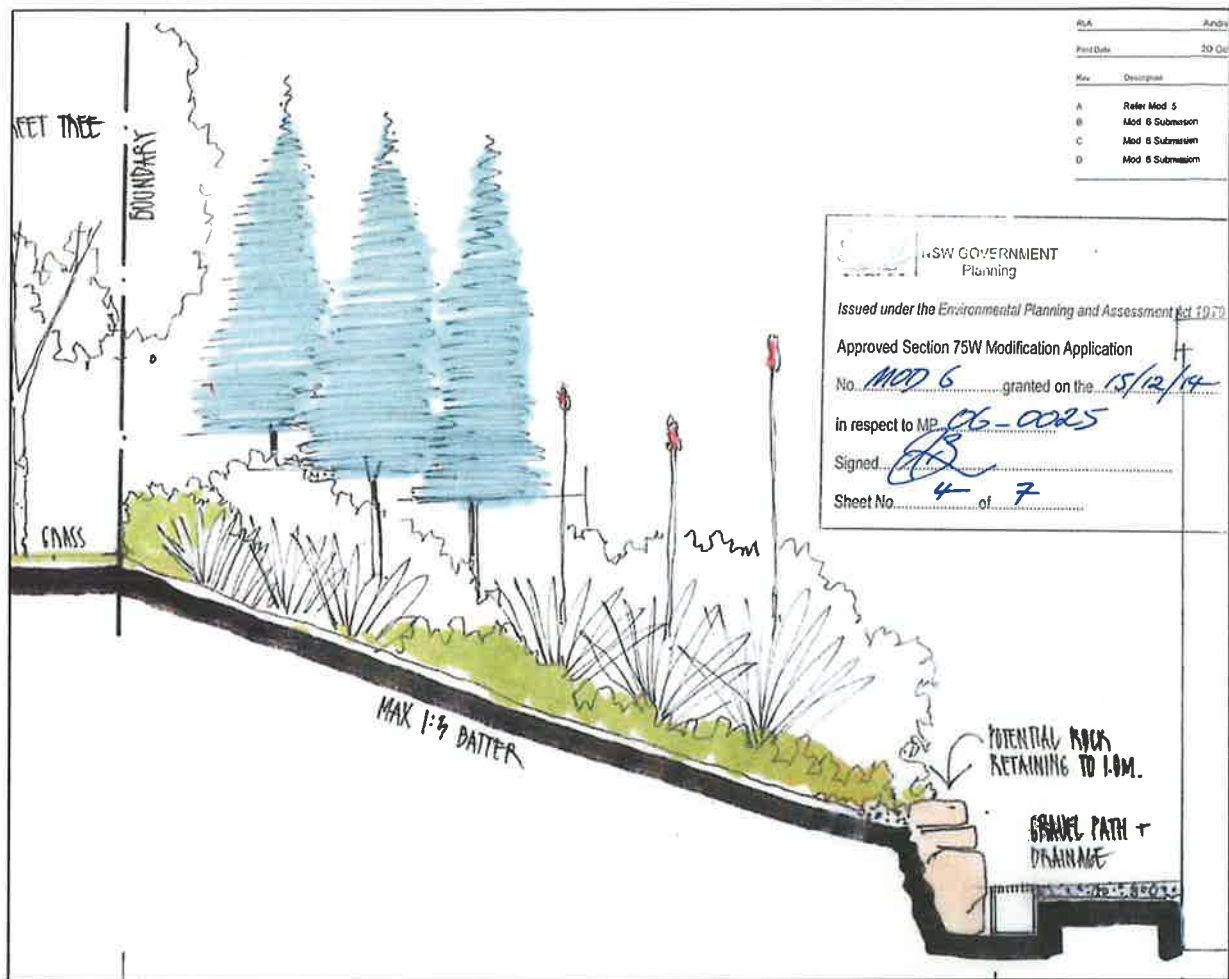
| Approved cross section of plantings to Moona Creek Road frontage showing indicative plantings
